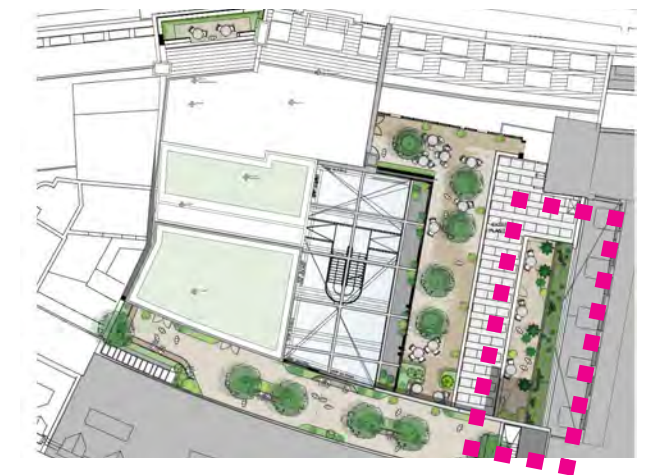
FLOOR 1 SOFT LANDSCAPE PLAN
